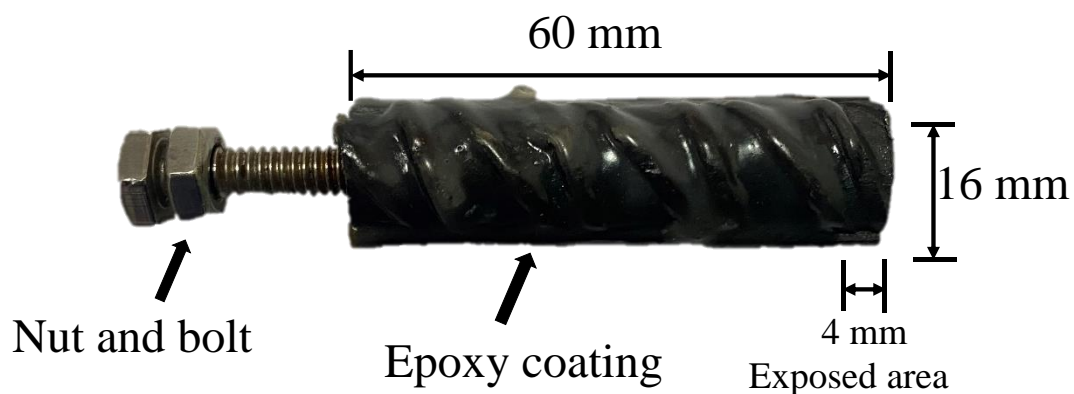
Cross sectional details of bare steel specimen for electrochemical measurements
